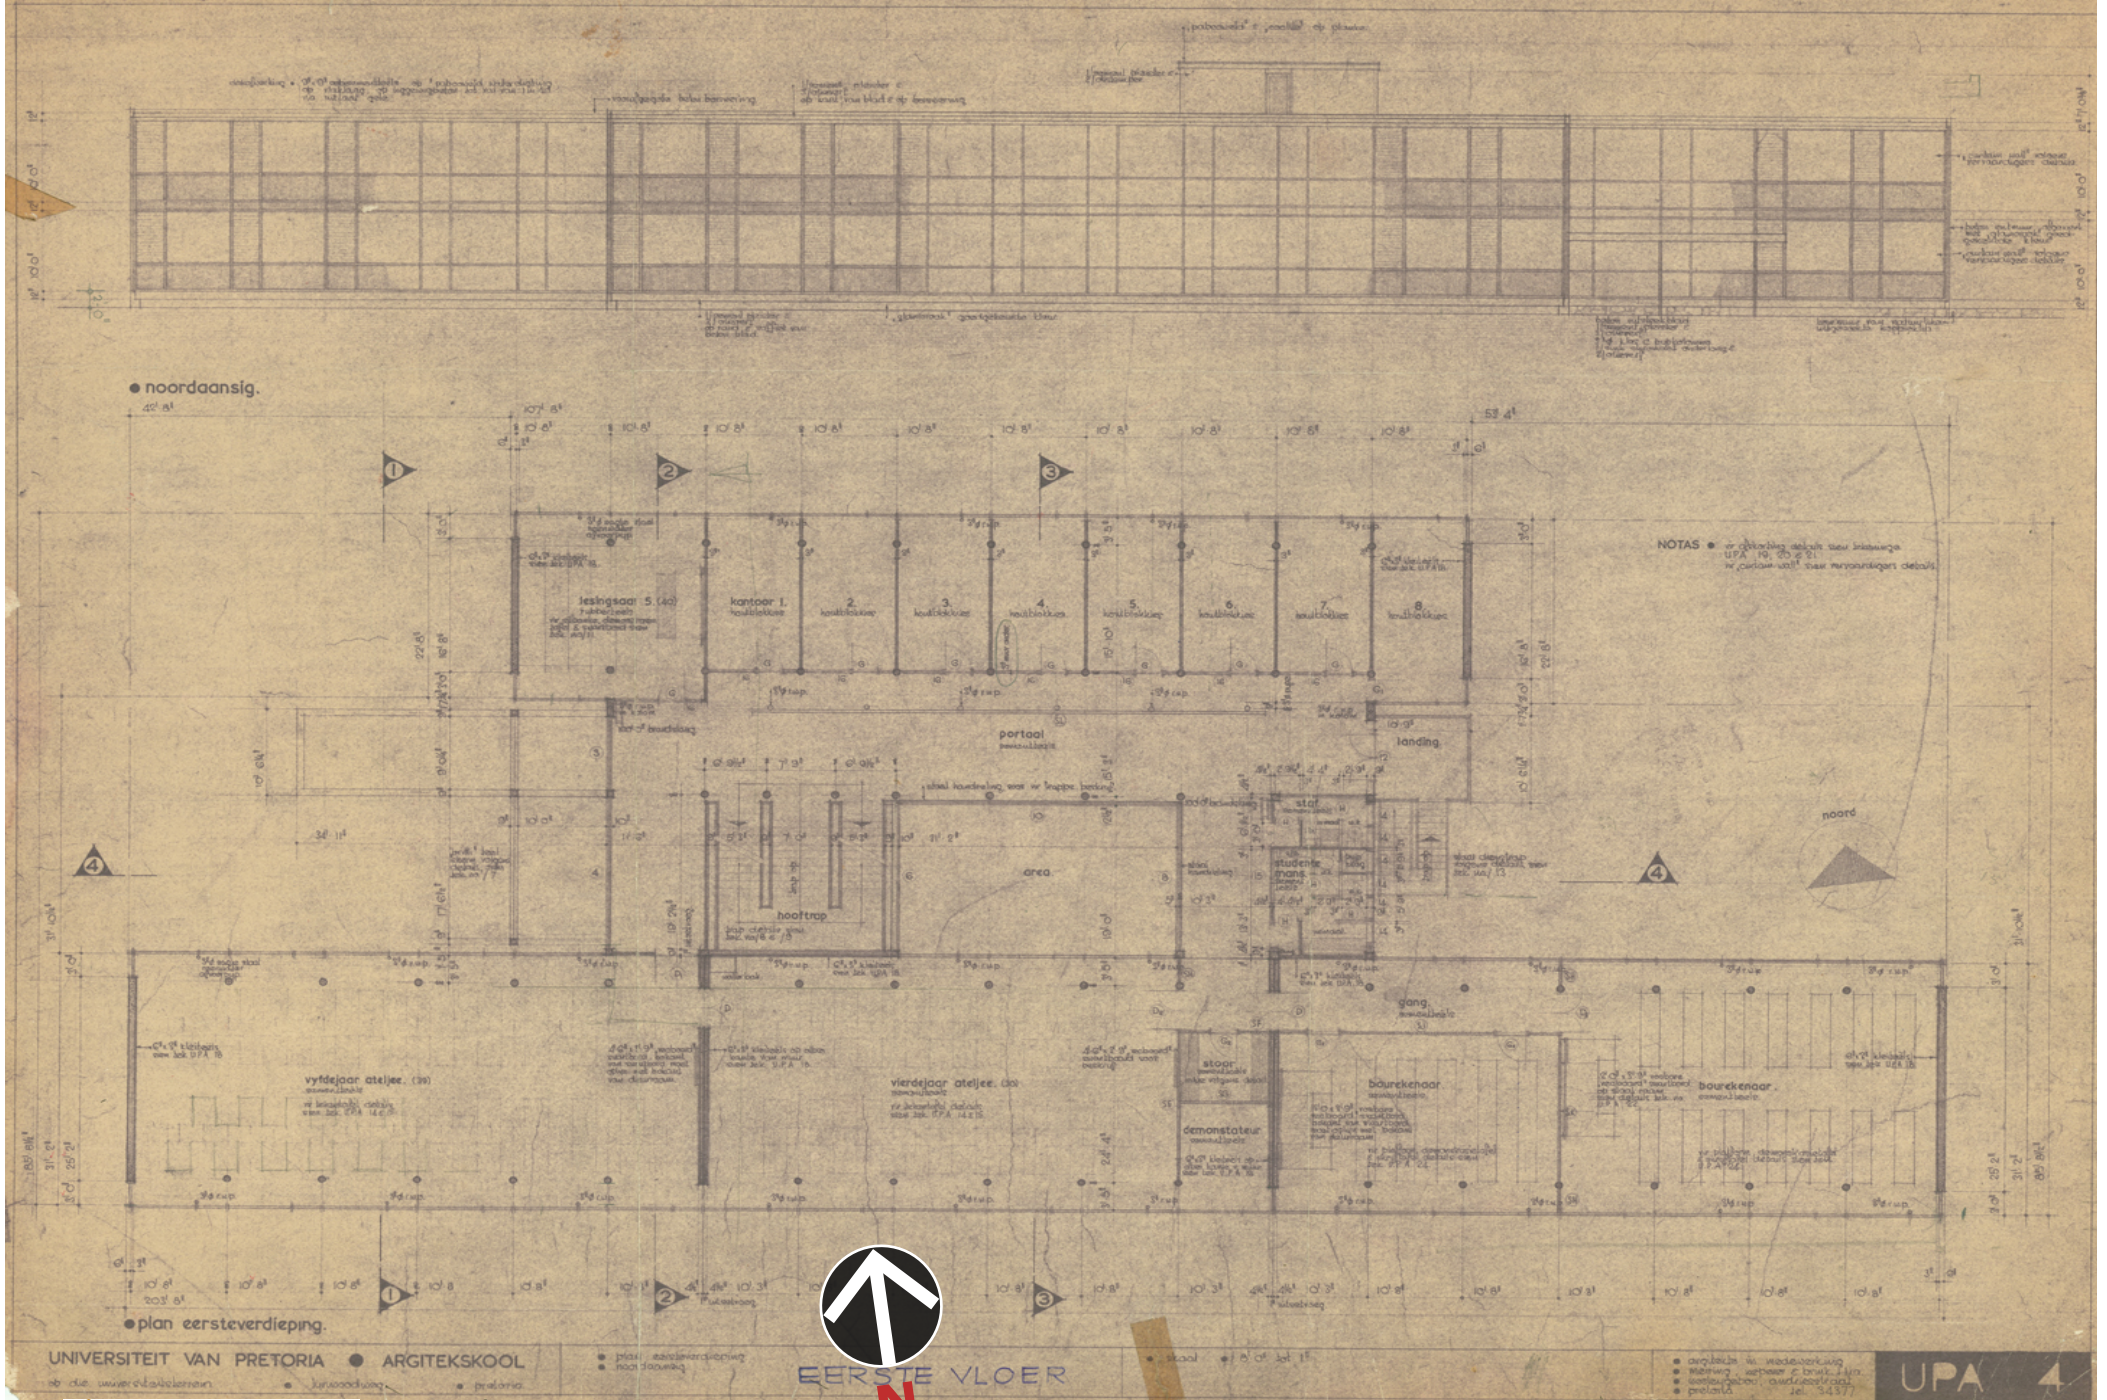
First Floor Plan - drawing no. UPA 4 (UP School of Architecture)
